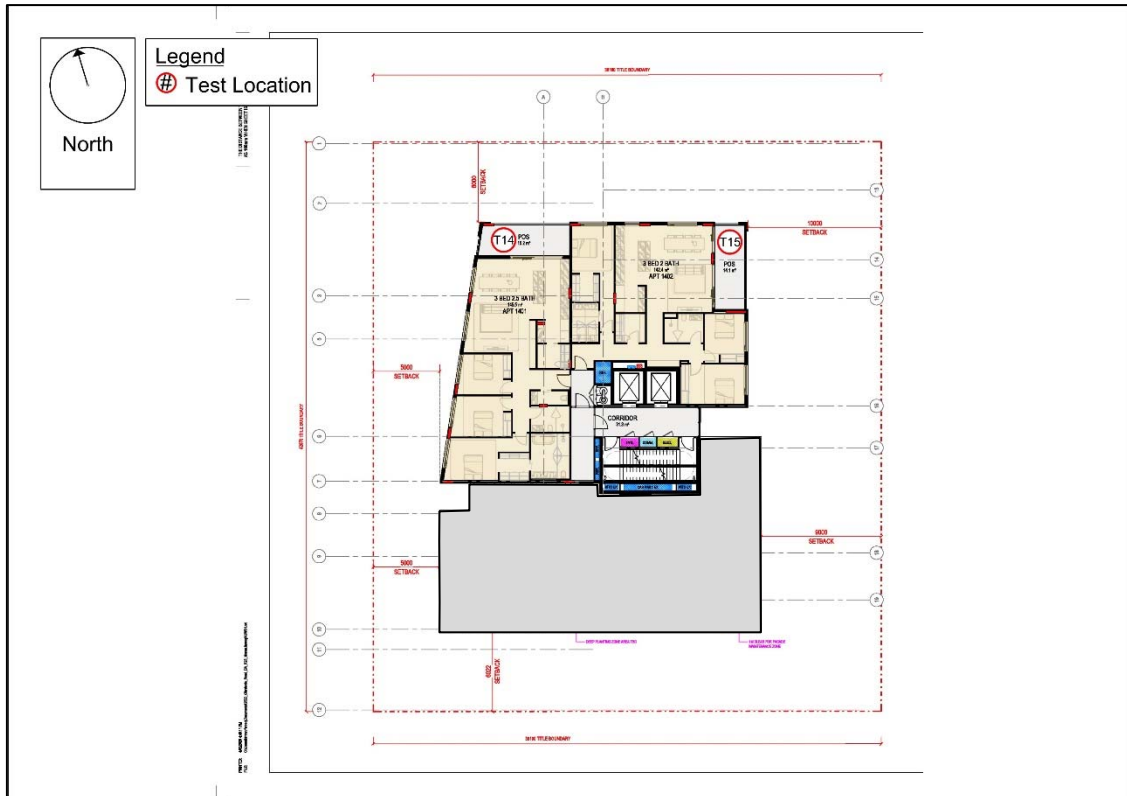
Test Locations on Level 14 of proposed 846-858 Glenferrie Road development.
